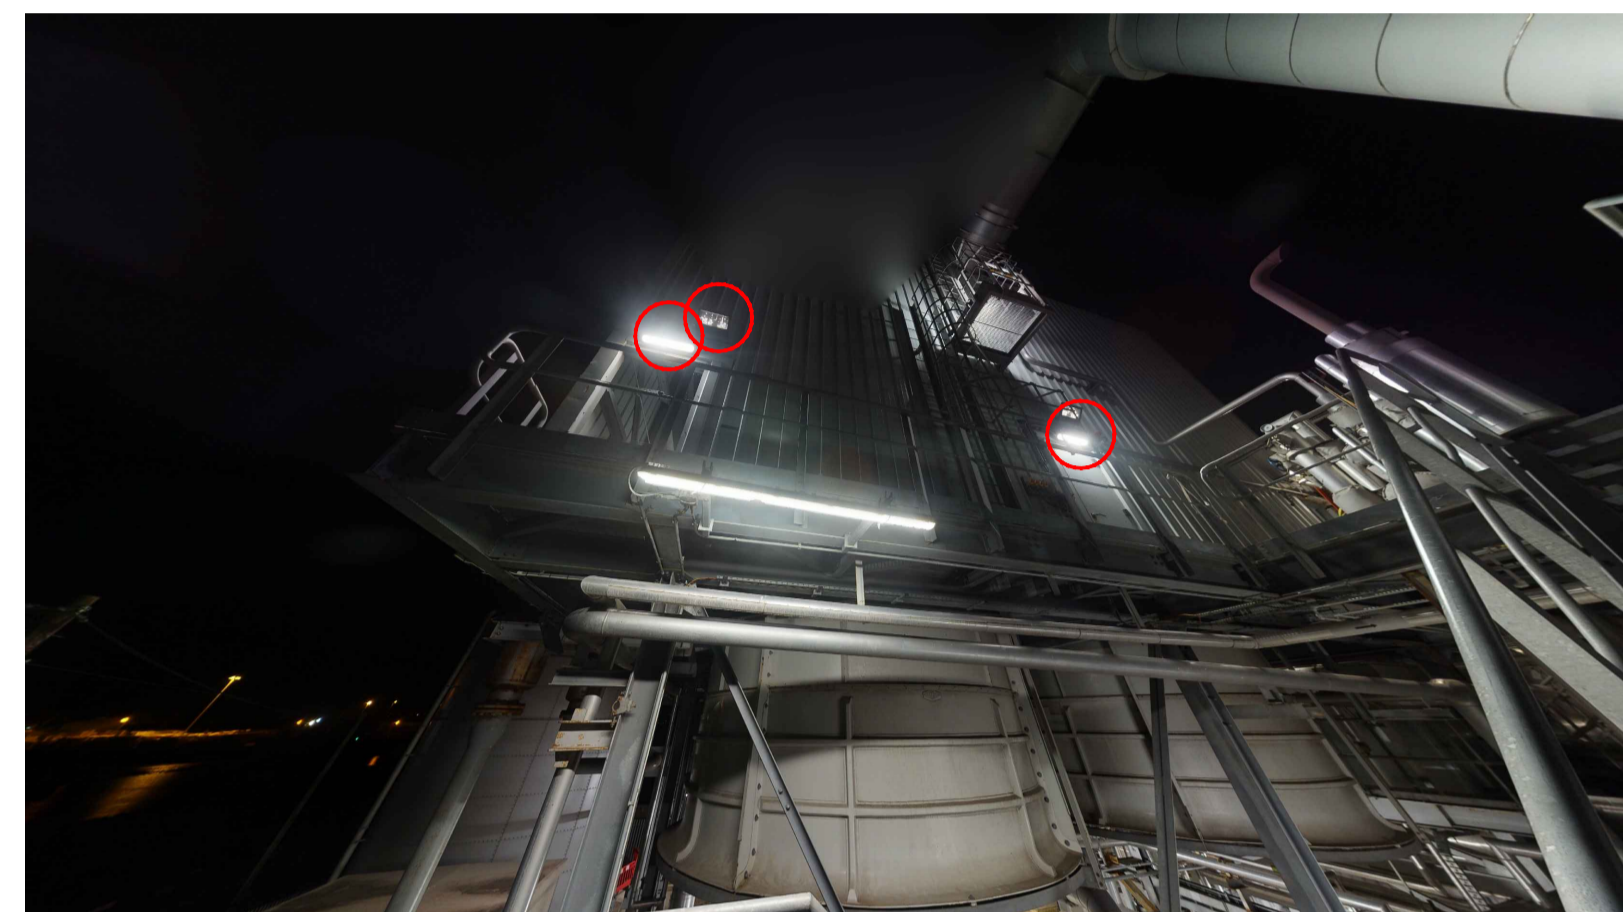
showing batten type luminaire mounted at finished floor level of first floor, batten type luminaire mounted above doorways 2.5 meters from first floor level and floodlight
